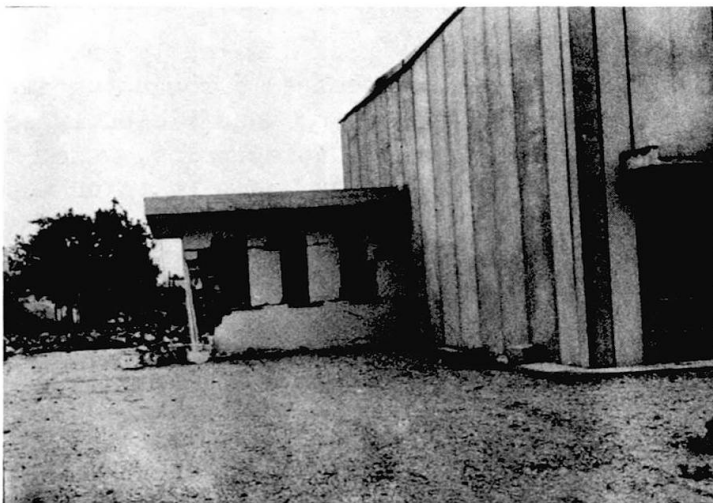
Prefabricated storage shed in Gemona as shown before. The supporting frames and the wall panels generally not damaged because of energy absorption in the material of the joints between the single panels.
